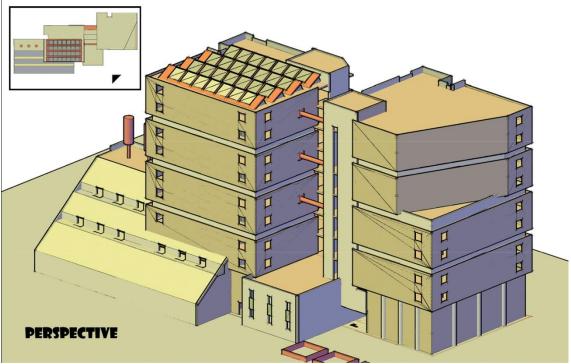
Perspective sketch showing the east south elevation of proposed model of vertical farm building in phase 2
